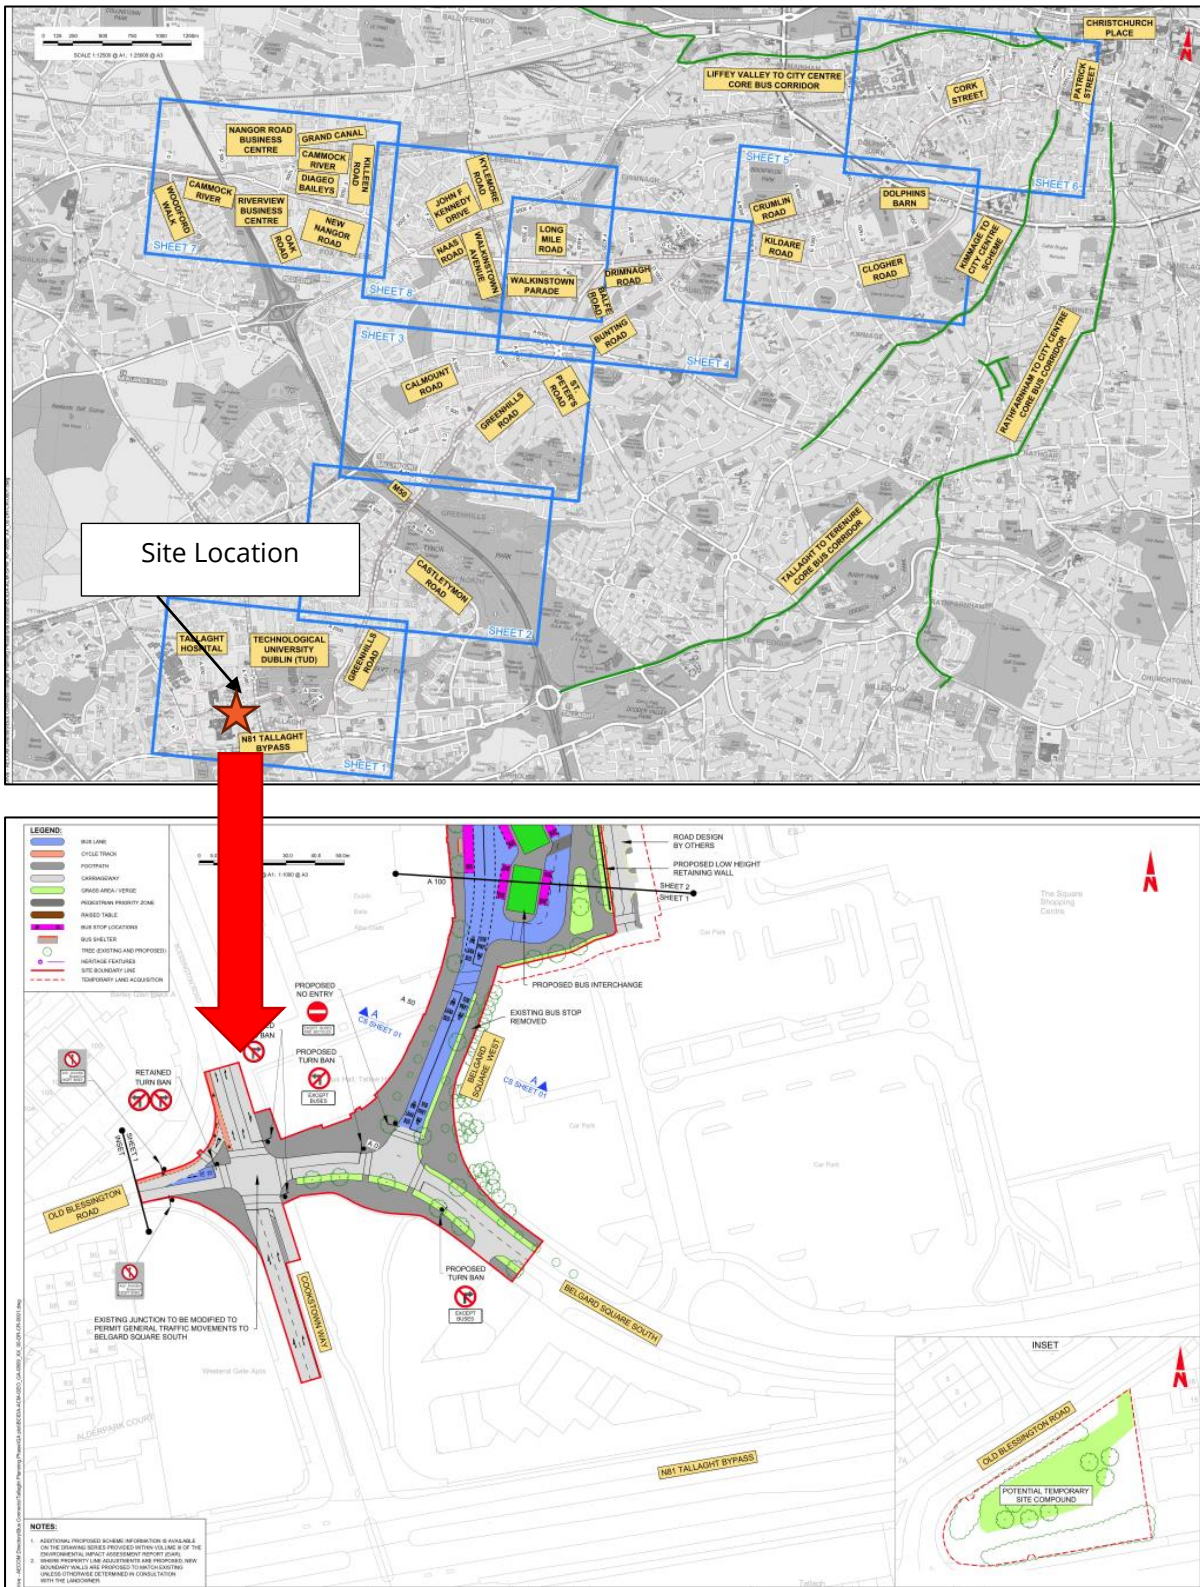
CBC Infrastructural Works adjacent to Subject Site
